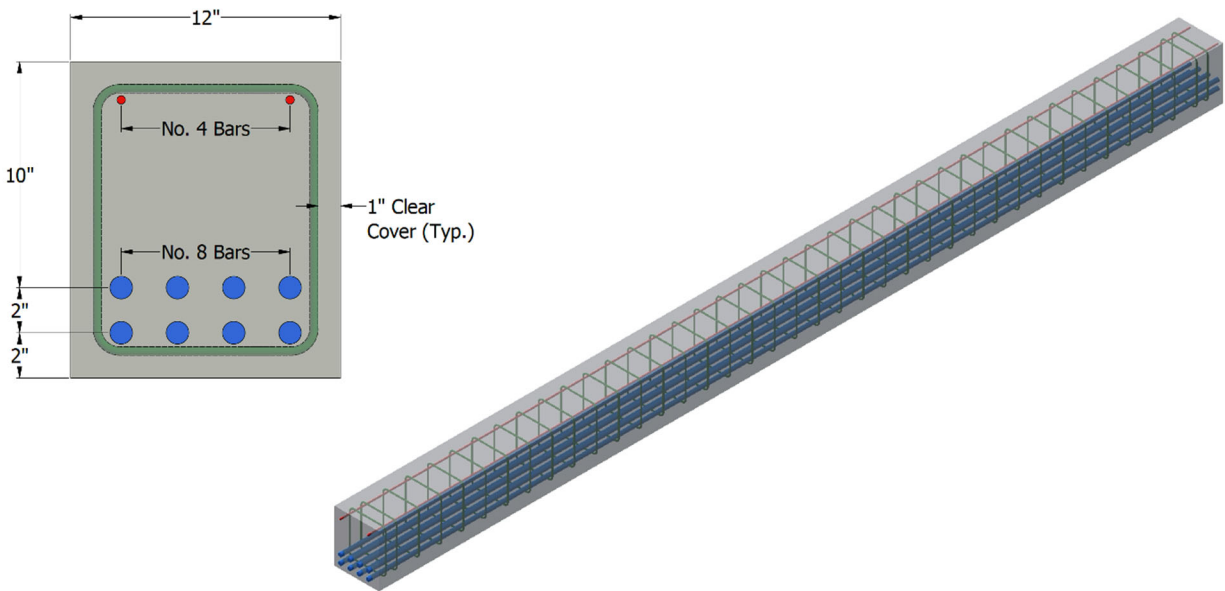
Compression-controlled beam cross section and rebar cage schematic.
